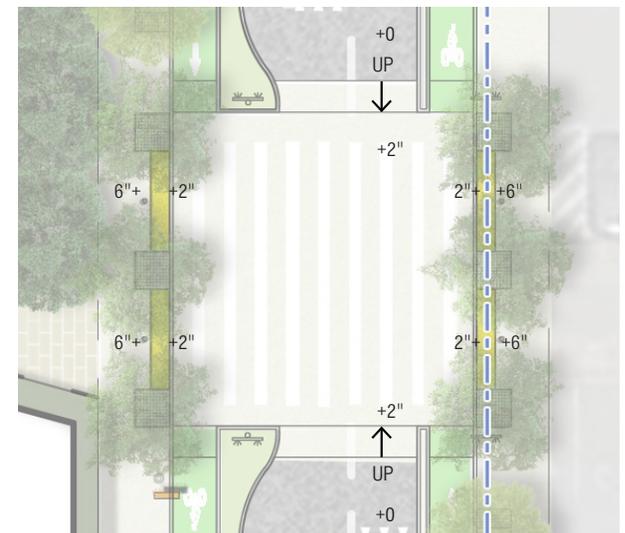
Raised Crosswalk at Lee Avenue and Reservoir Park
